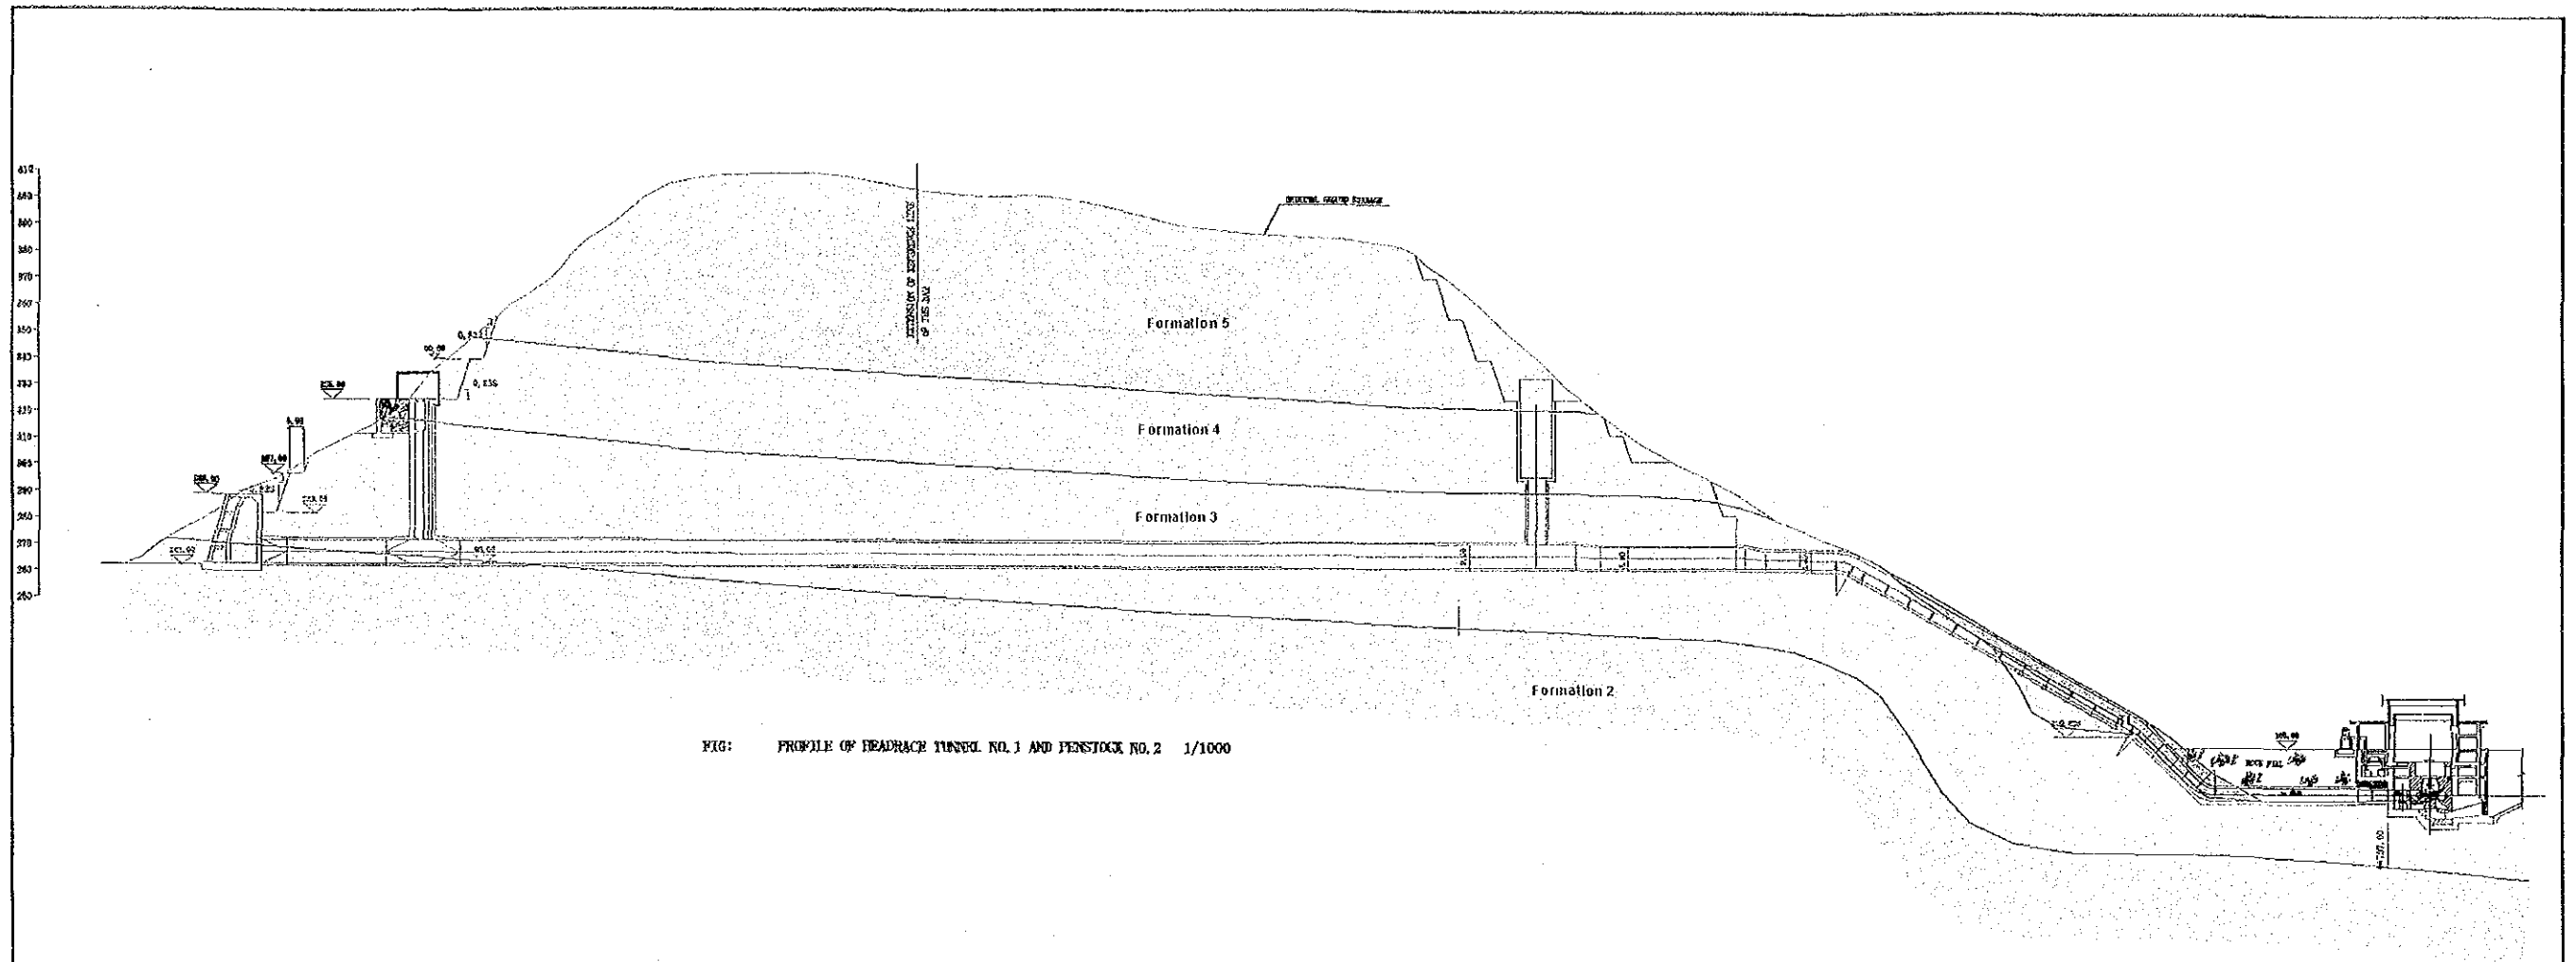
FIG: PROFILE OF HEADRACE TUNNEL NO.1 AND PENSTOCK NO.2 1/1000
